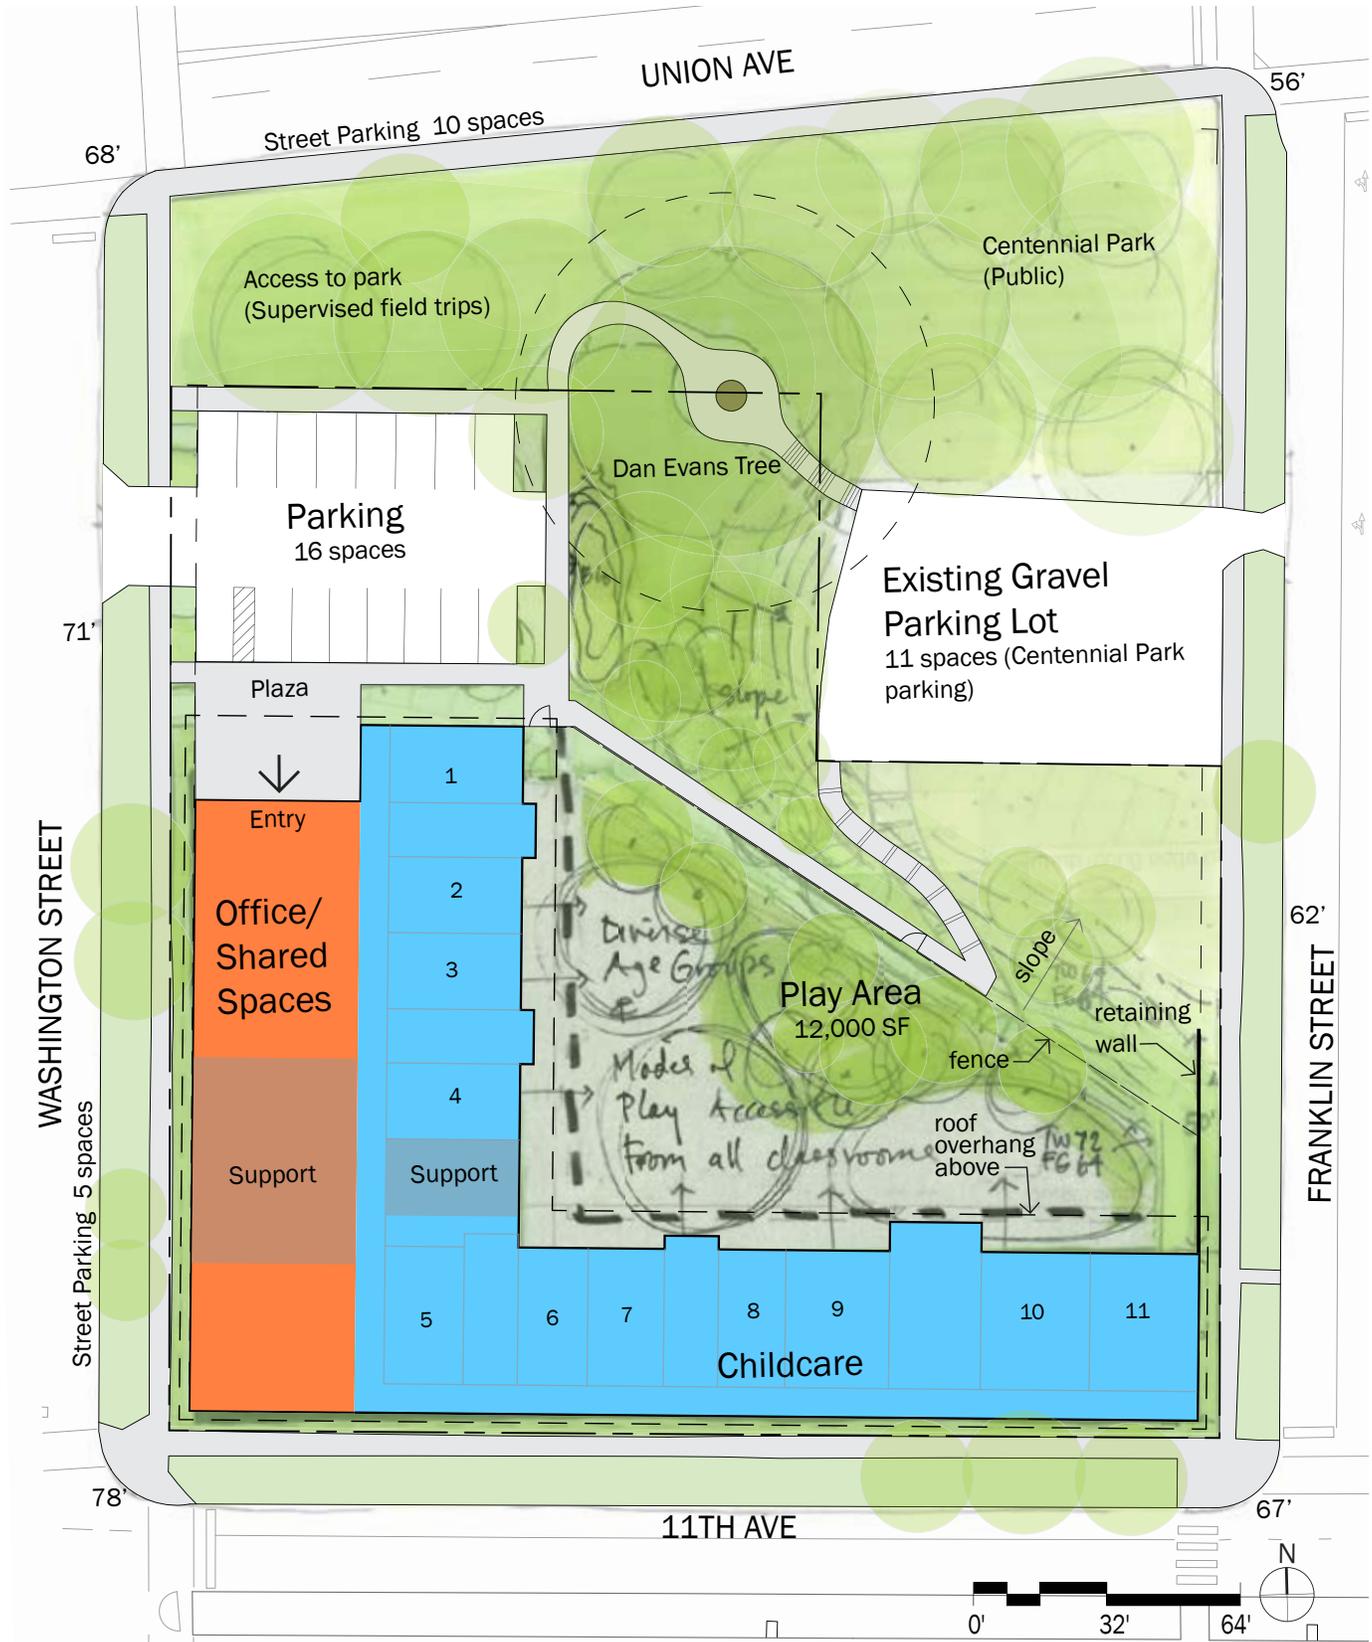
Basic Site Plan Diagram of Preferred Site
